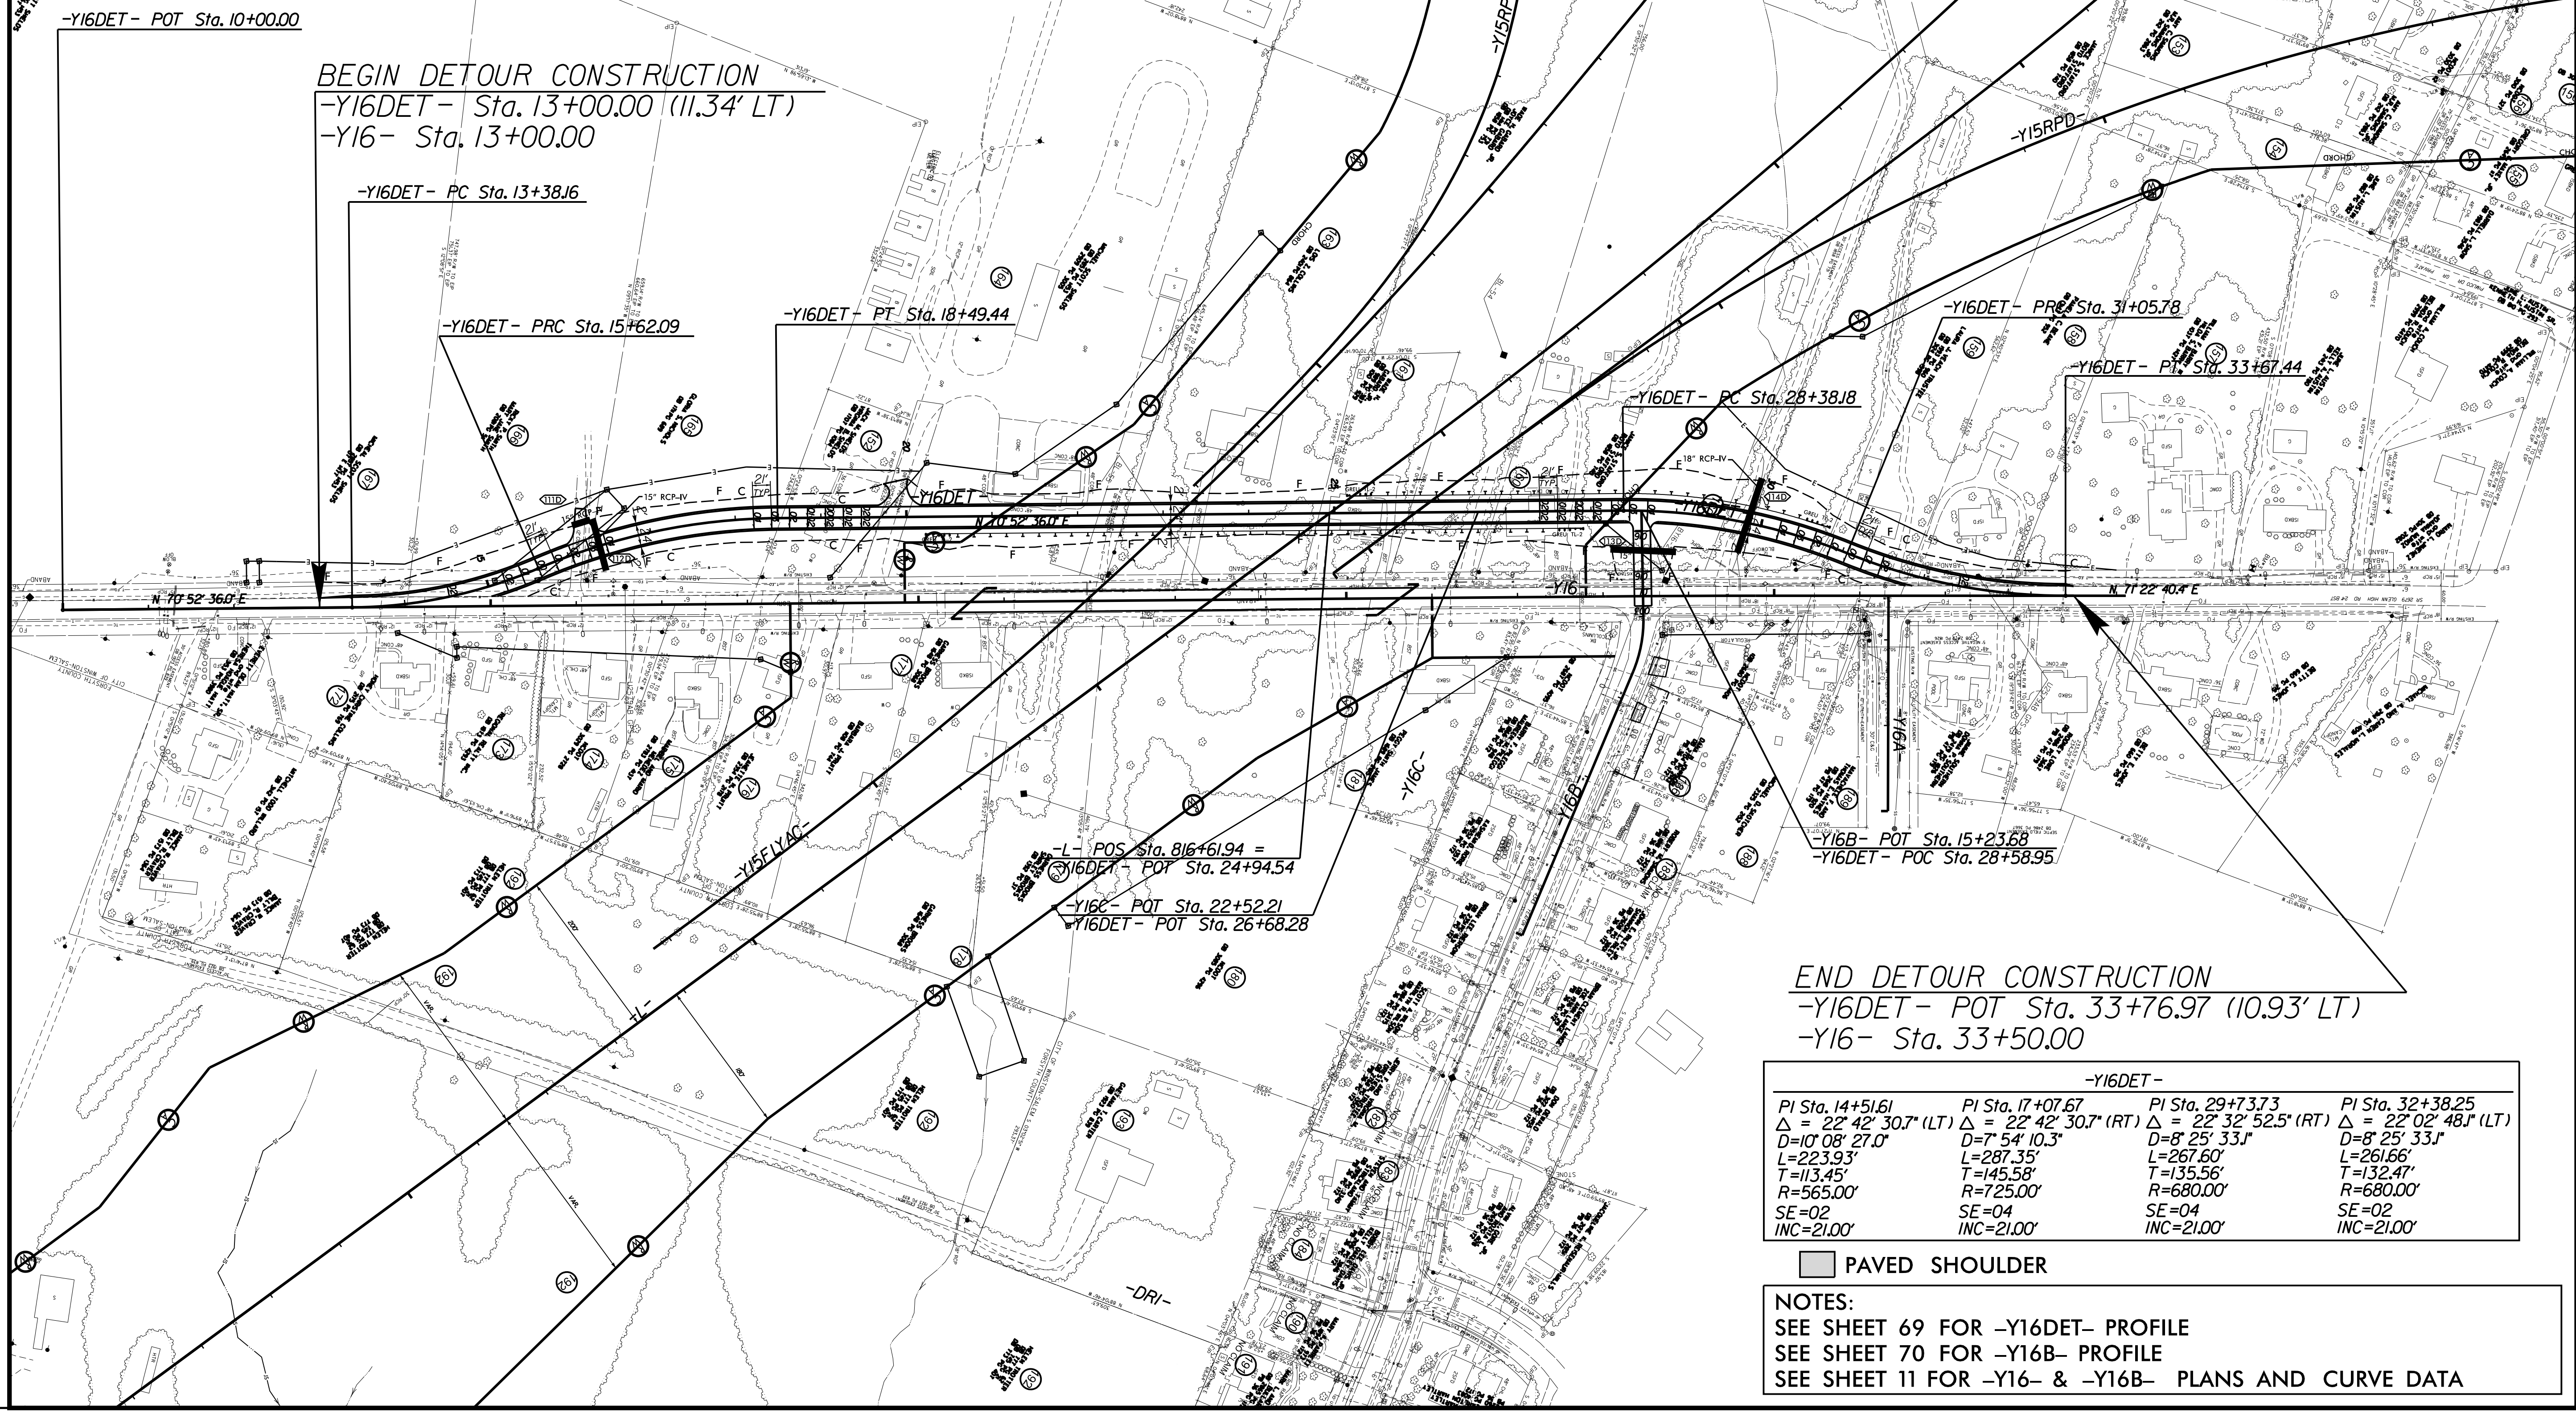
DETAIL FOR GLENN HI RD ON-SITE DETOUR (-Y16DET-)
